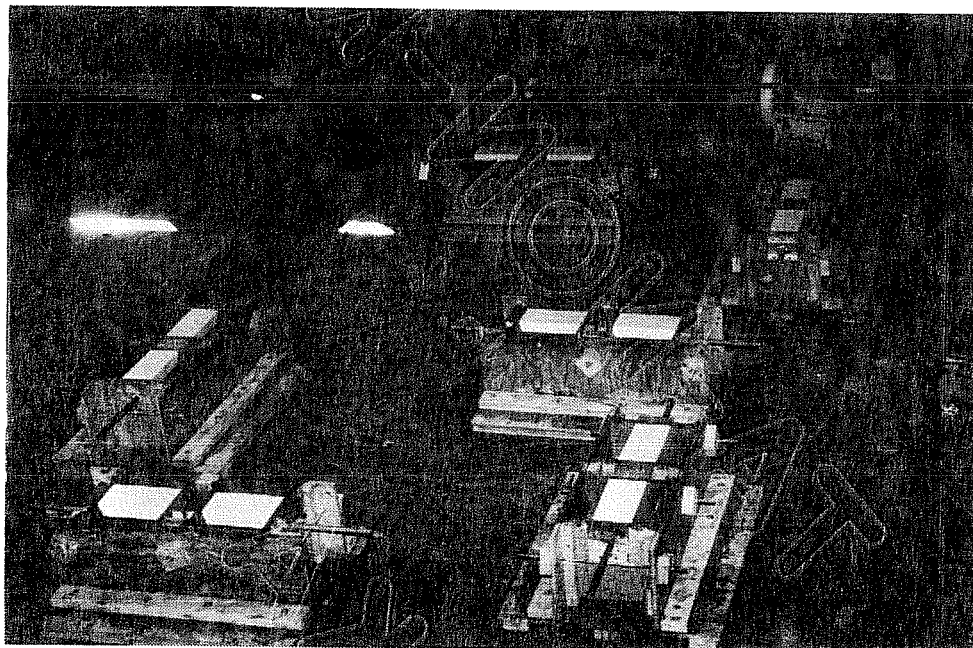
Overall view of the formwork built for Type A pullout specimens.
